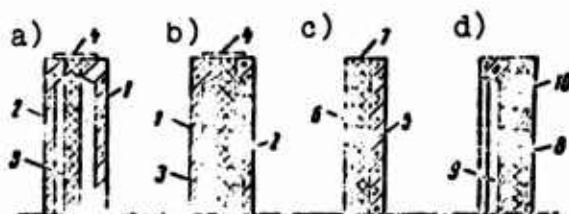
Wall panels: a, b, c, d) the diagrams of wall panels of various designs; 1 and 2 - ferroconcrete ribbed slabs; 3 - heat insulation; 4 - the welding point of slabs with the aid of matching parts and facings; 5 - a support prestressed ferroconcrete slab; 6 - light facing slabs made from armoured cement, asbestos-cement or lightened ferroconcrete slab; 7 and 8 - heat insulation; 9 - ribbed support ferroconcrete slabs; 10 - the facing slabs.
